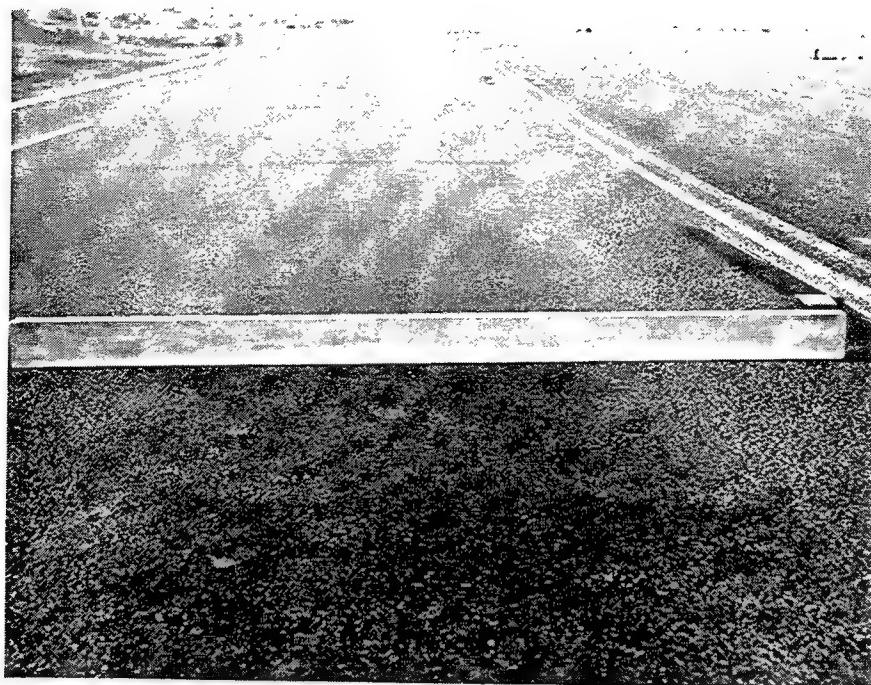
Typical transverse smoothness of southbound lane on Lancaster Blvd., note transverse lines in background caused by excess asphalt
